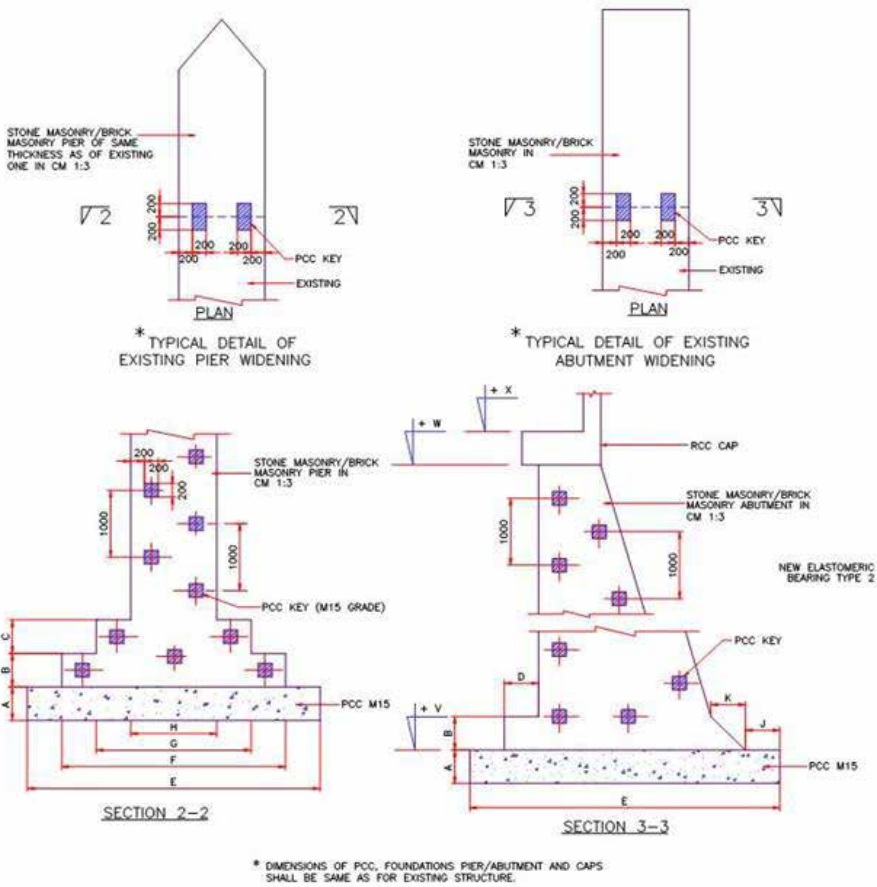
WIDENING OF MASONRY PIER & ABUTMENT USING SHEAR KEYS
